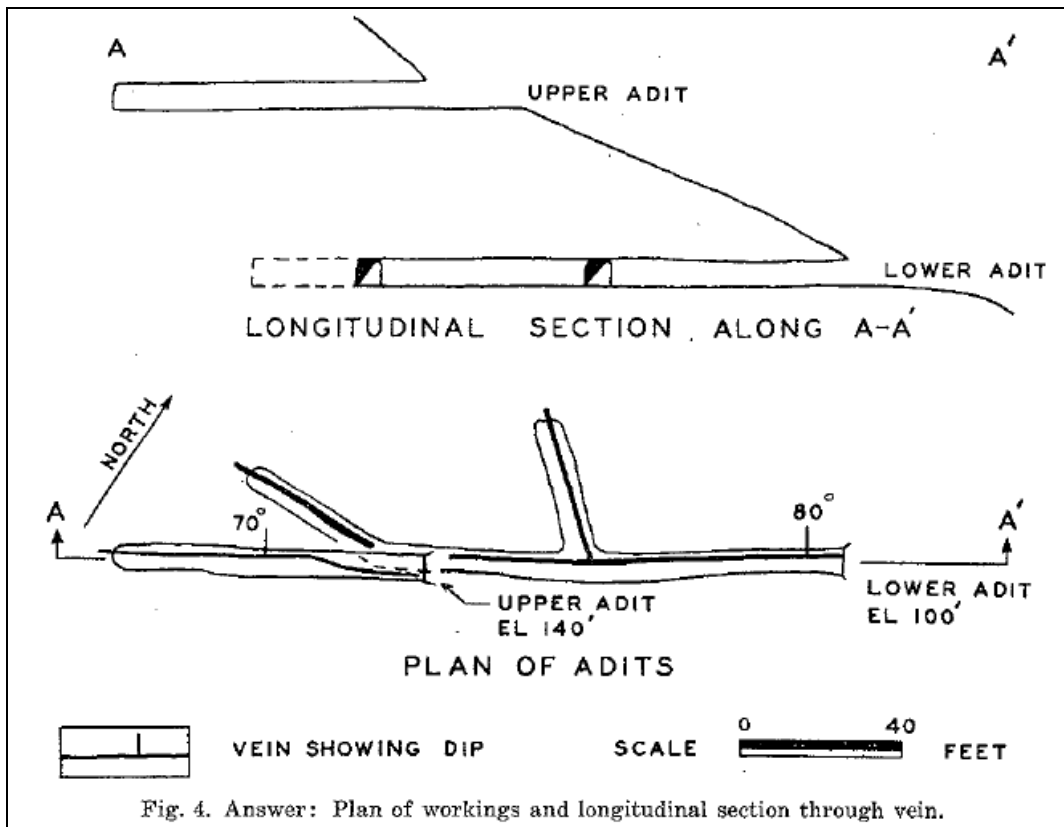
Answer: Plan of workings and longitudinal section through vein.
